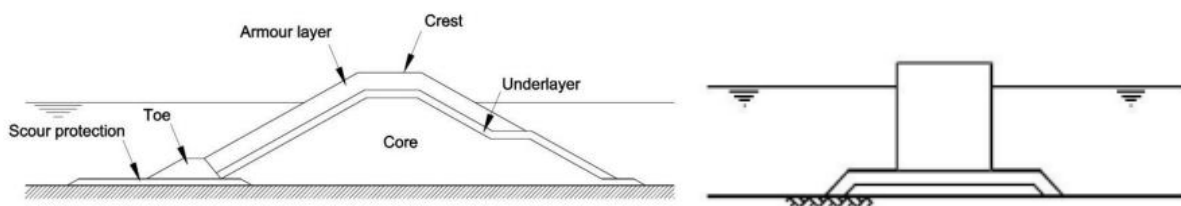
Typical Cross section of a rubble mound breakwater (left) and a vertical type breakwater (right) (CIRIA, et al., 2007).
